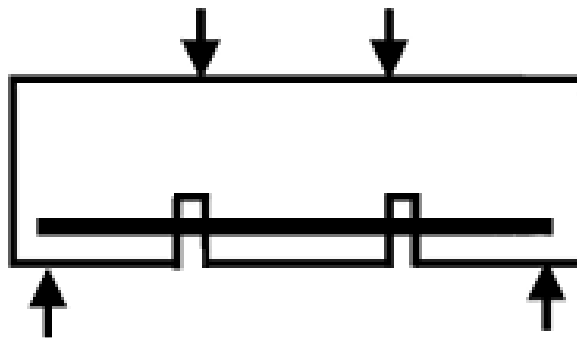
Beam anchorage specimen (ACI, 2003)
